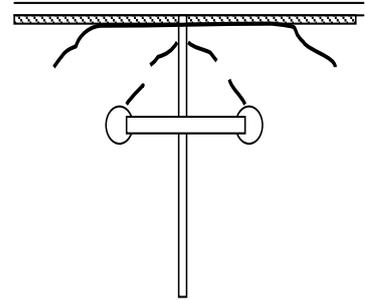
General Patterns of Crack Defects on Steel Attributes
